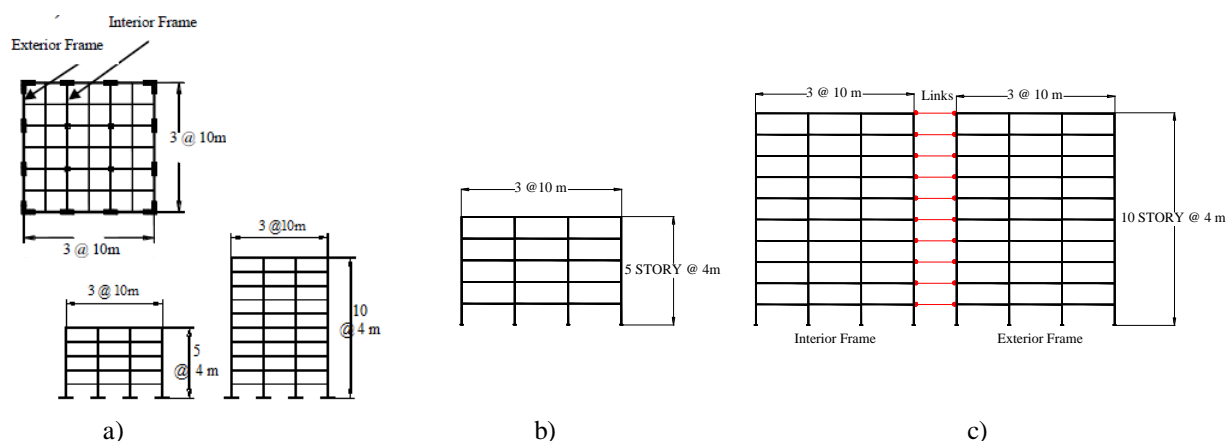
a) Original building plan and elevation and two-dimensional model used for non-linear analysis of the b) 5-story building and c) 10-story building.
